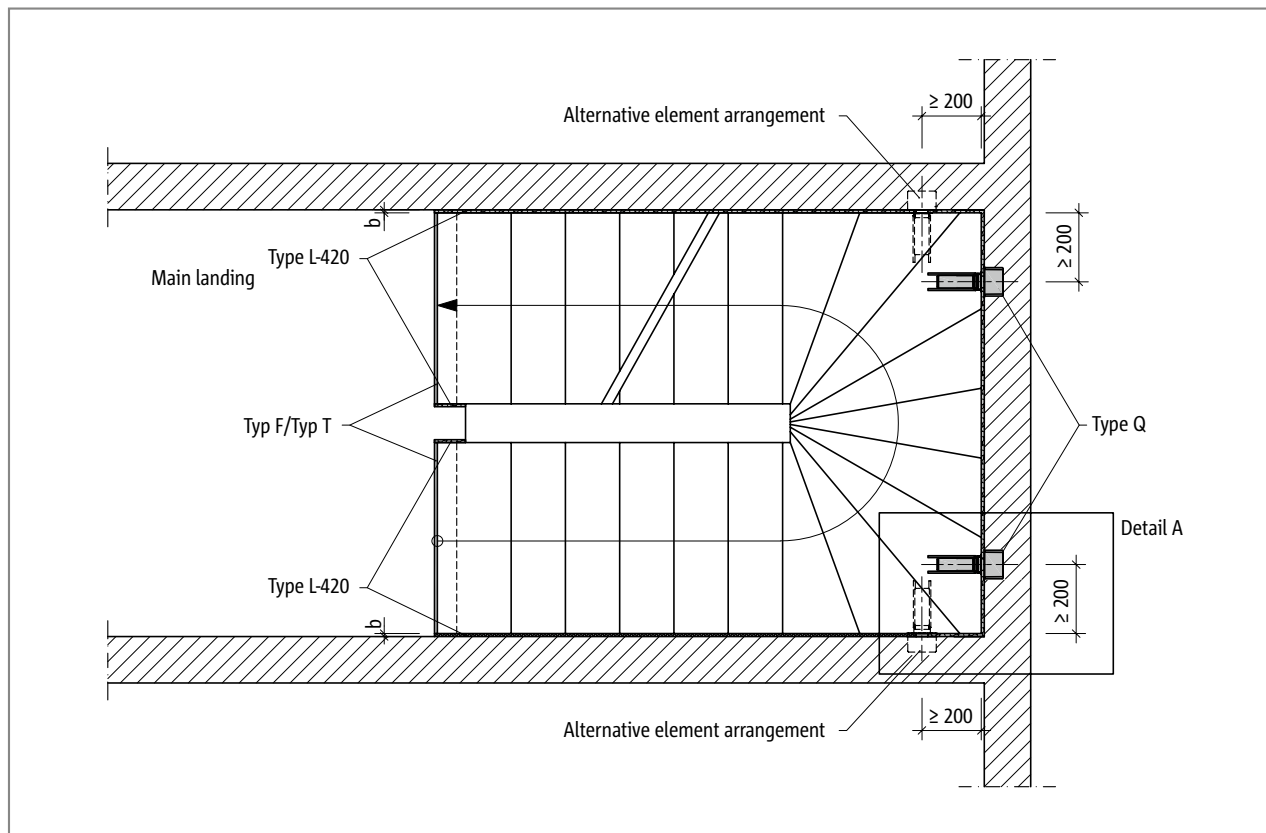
Schöck Tronsole® type Q: Component arrangement in the layout using the Tronsole® type L
